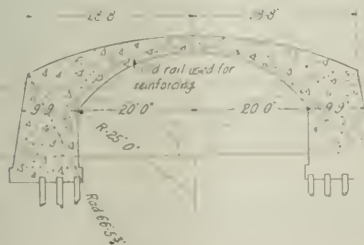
Forty-foot Arch Over Beaver Brook, Bridgeville
